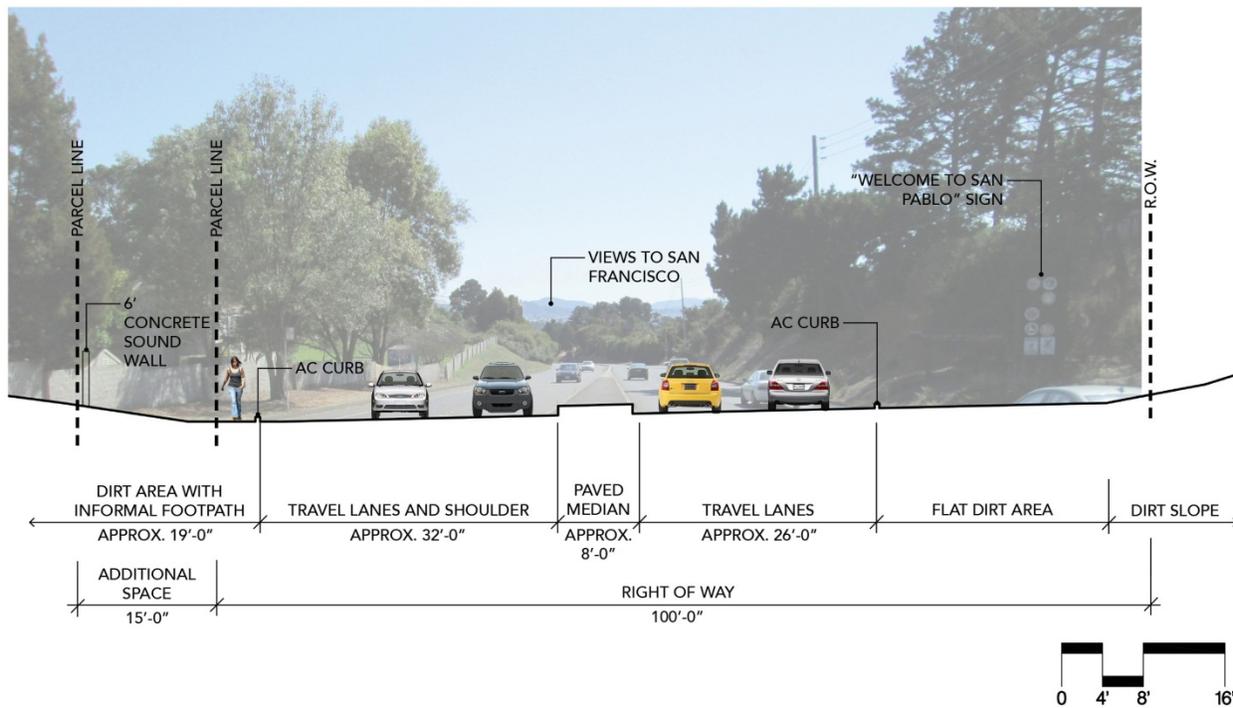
San Pablo Avenue Section 2 – Looking southbound near Stanton Avenue
